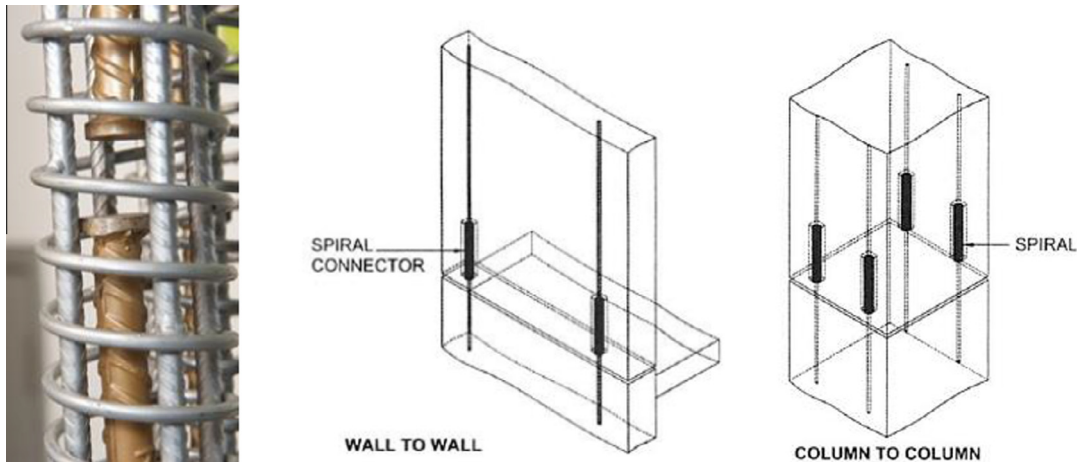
HDB spiral connection [8] and its application in precast concrete wall-to-wall and column-to-column connections [9].
